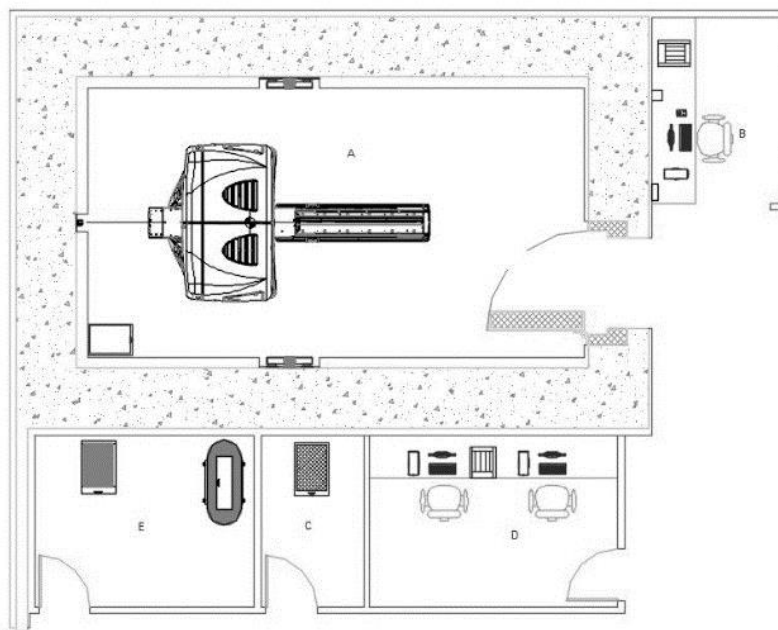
Typical Radixact™ System Floor Plan without Maze Walkway
